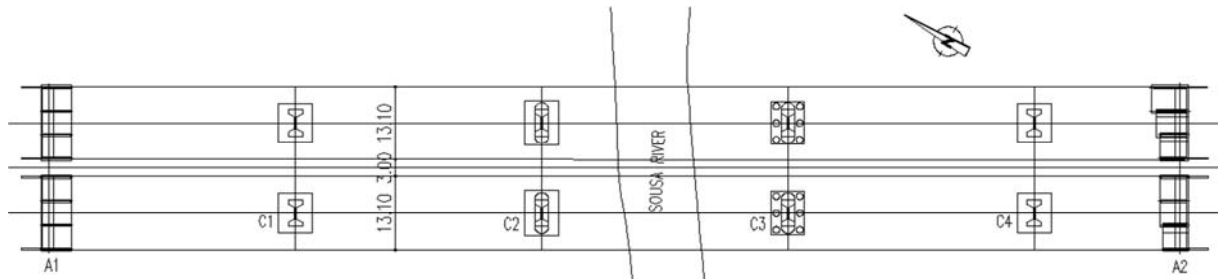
Sousa river bridge, horizontal plan (m) [105].
